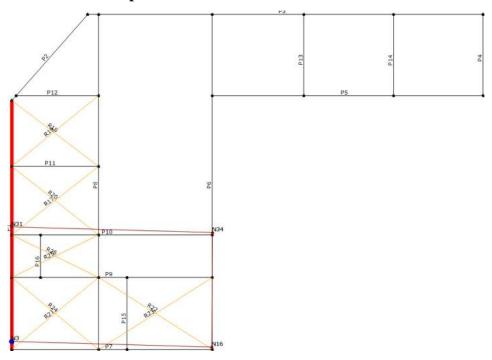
Plan deformed shape for Y direction after reinforcement
